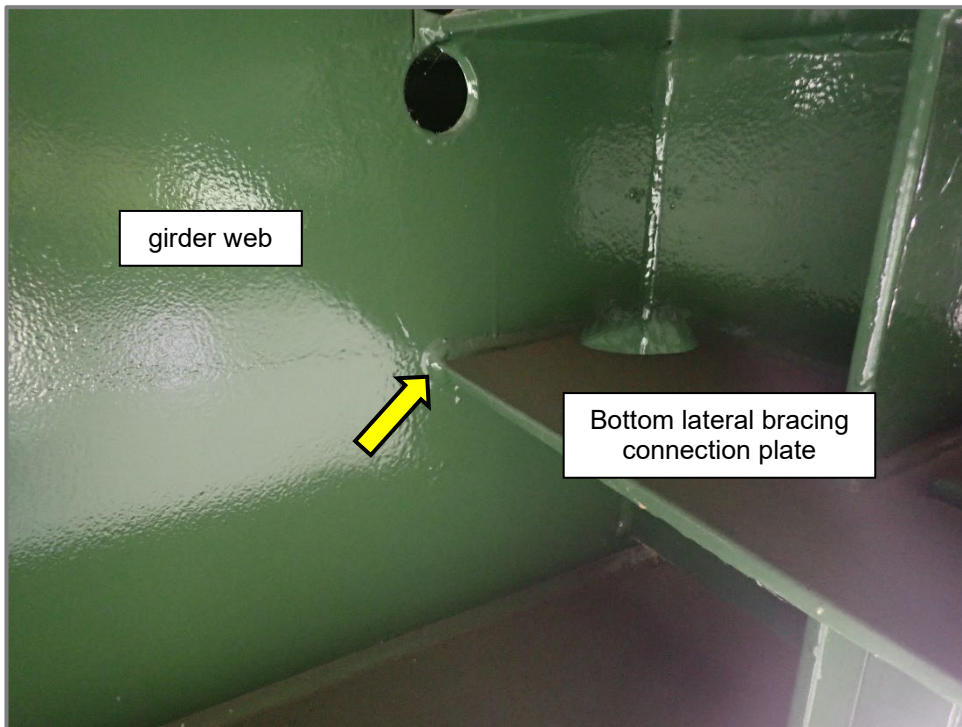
Base metal at lateral bracing connection plate to girder web welds (Category E). Girder F at Floorbeam 37 shown, looking south.
